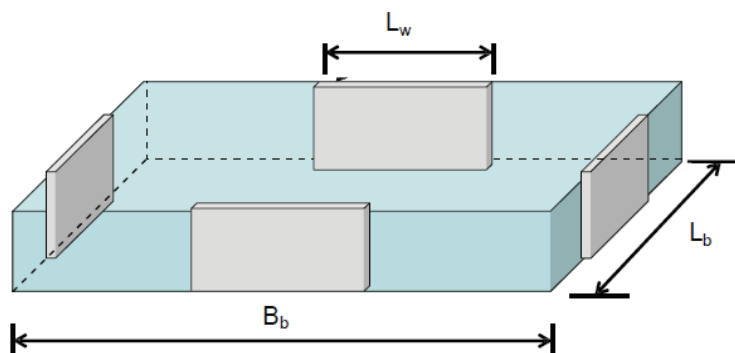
Archetype configuration for reinforced concrete shear wall structures (from NIST, 2010).
